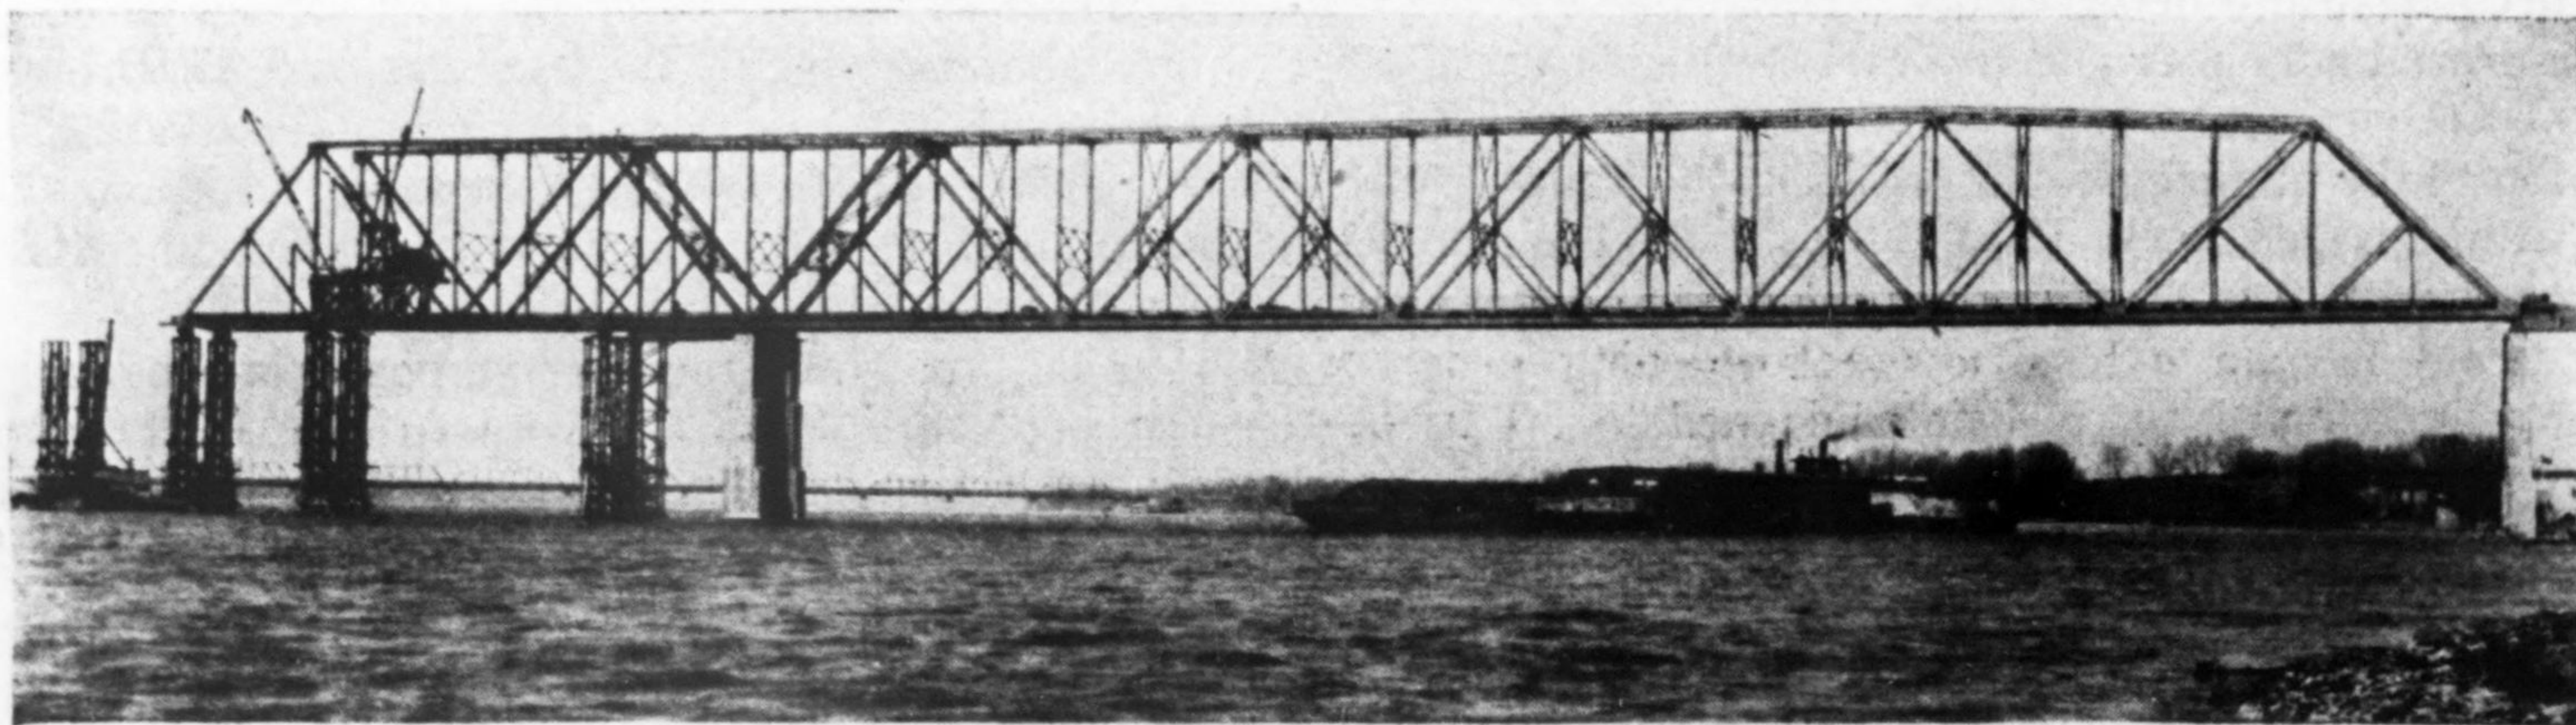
ERECTING 1,257-FT. CONTINUOUS TRUSS
